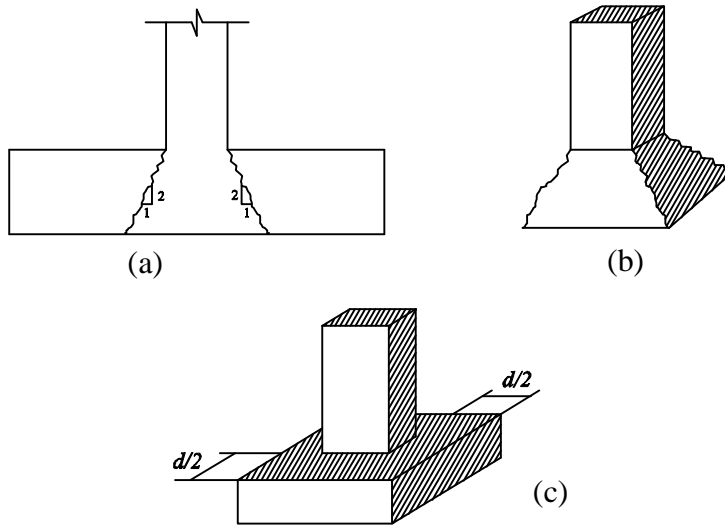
Punching shear: (a) punching shear failure of an isolated footing; (b) actual failure surface; (c) assumed failure surface
